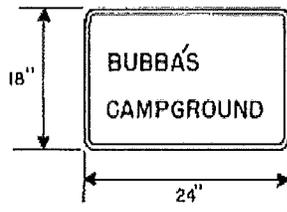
TYPICAL TRAILBLAZER SIGN DETAIL
